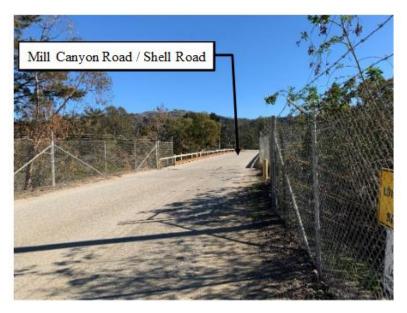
East-facing view of the west side of the bridge crossing the Ventura River to access the Devil's Canyon Road Site
